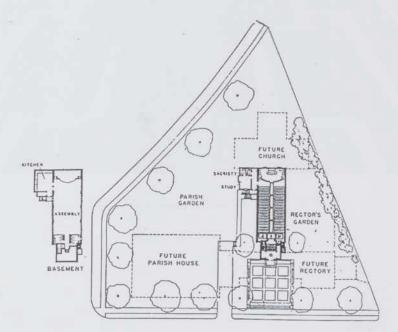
St. Mark's Episcopal Church, site plan showing original cruciform plan.
